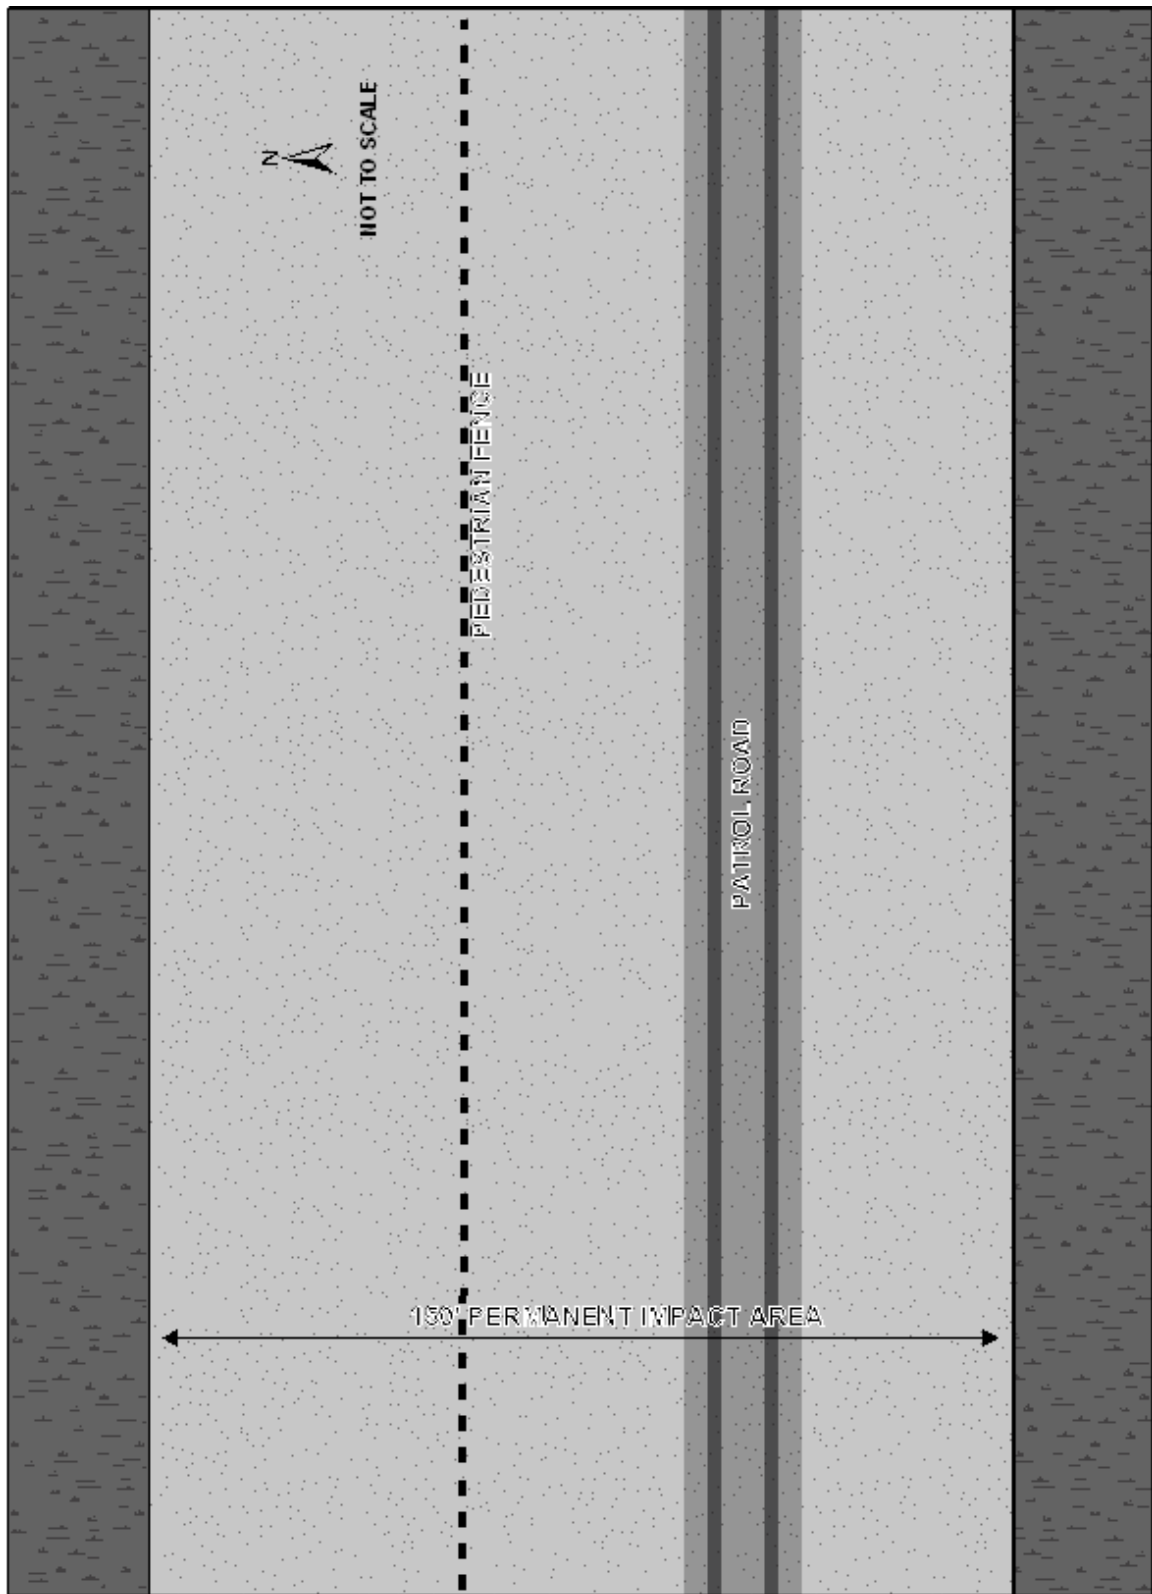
Schematic of Typical Project Corridor – Section M-1
